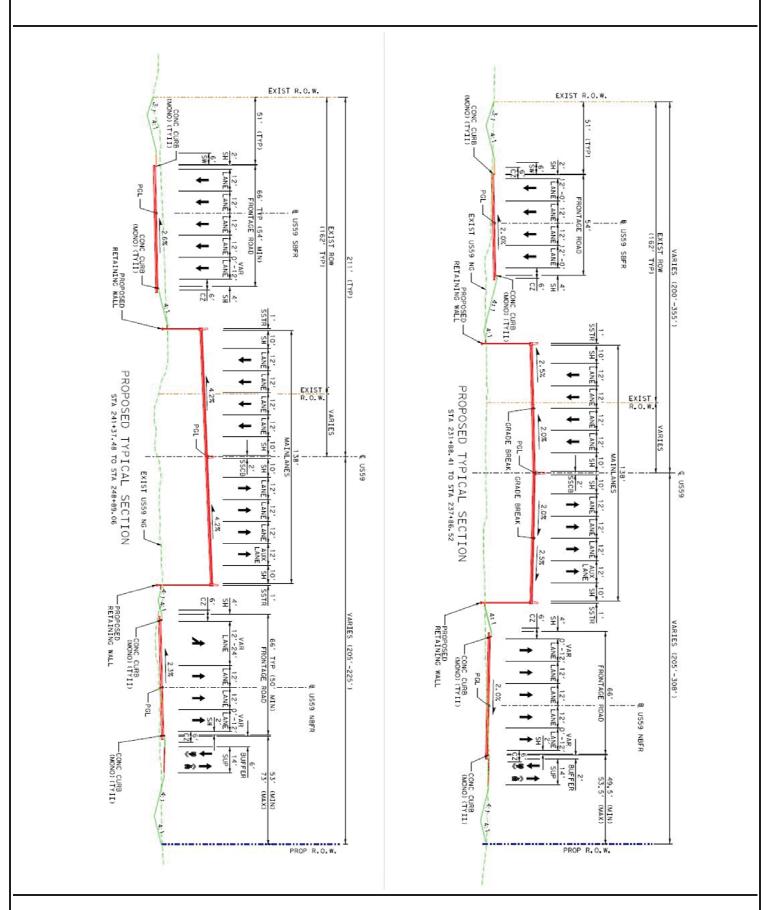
Exhibit D: Existing and Proposed Typical Section US 59 Loop — CSJ # 0086-14-058, etc.
